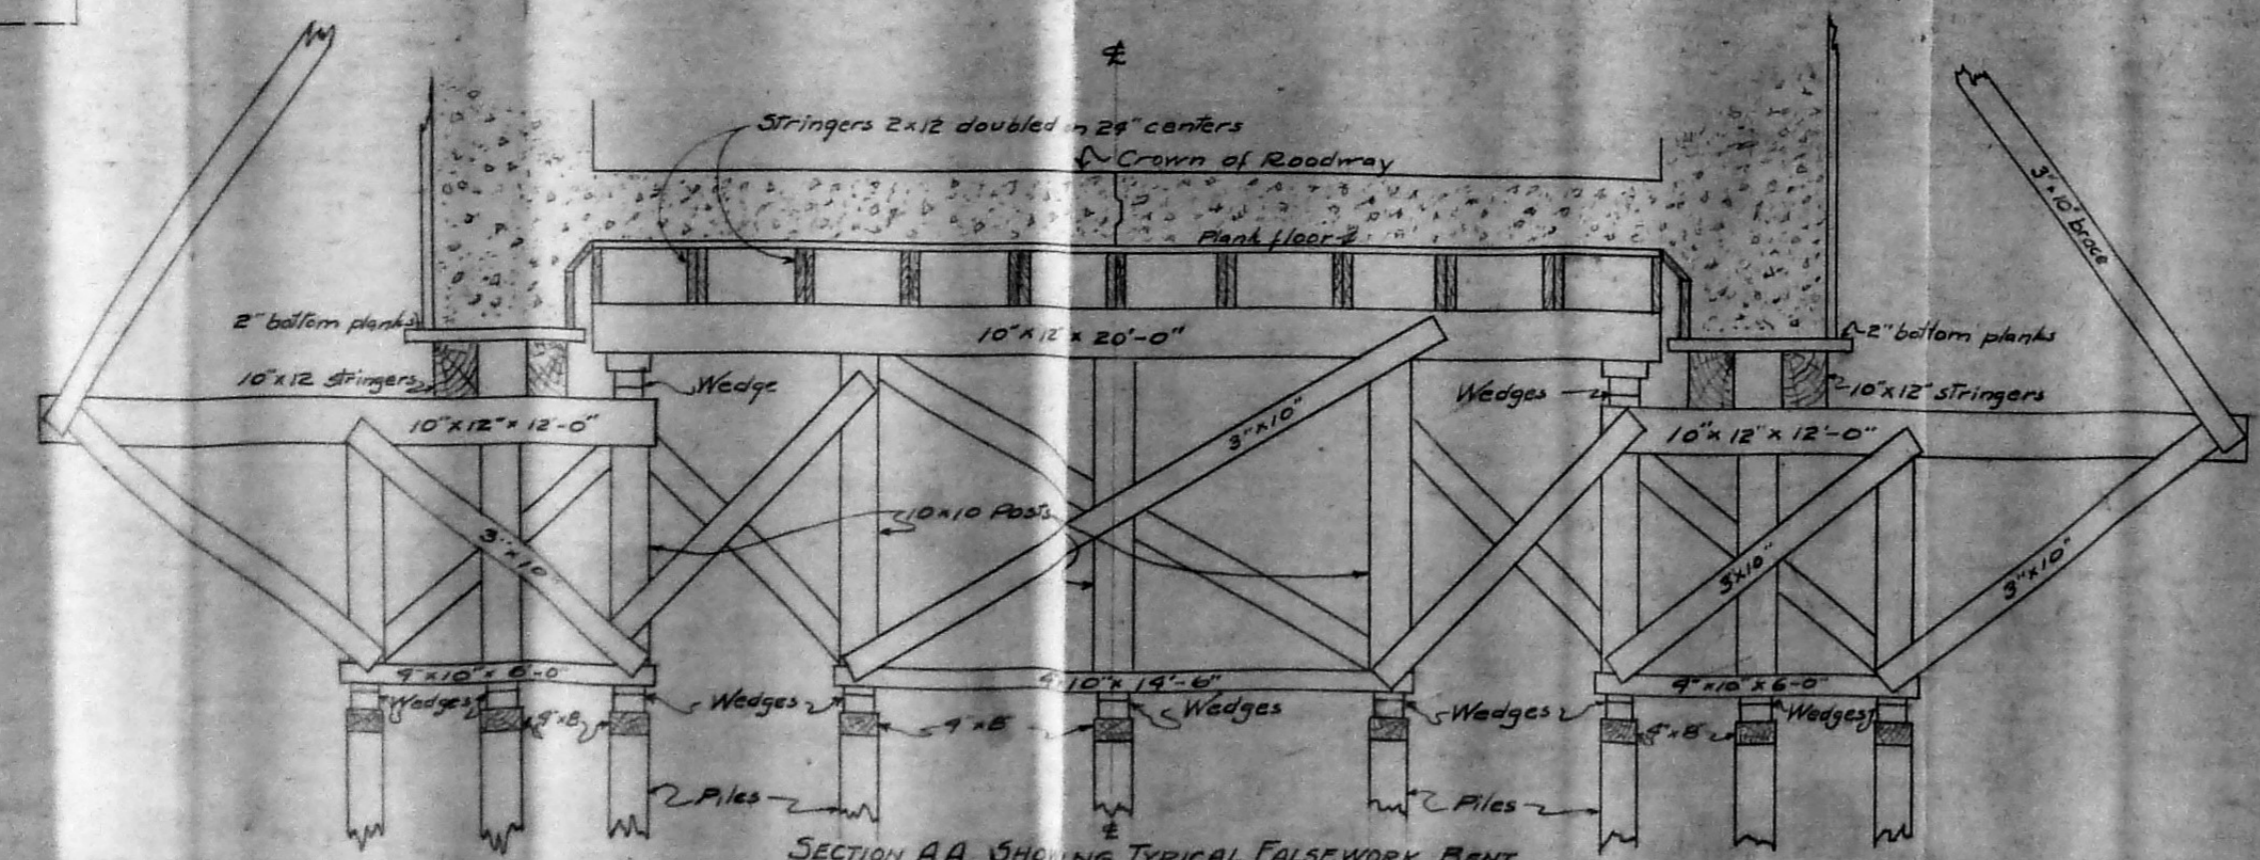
DETAIL OF STRINGERS AND BENTS UNDER BRACKET
